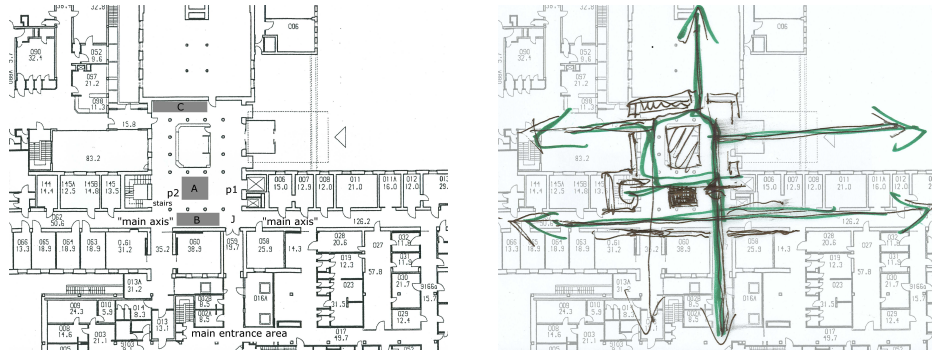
Case 1: Ground floor plan showing the hall where the waiting area had to be placed (left). Informer 2 analyzes main pathways and visitor flows in the hall (right).
